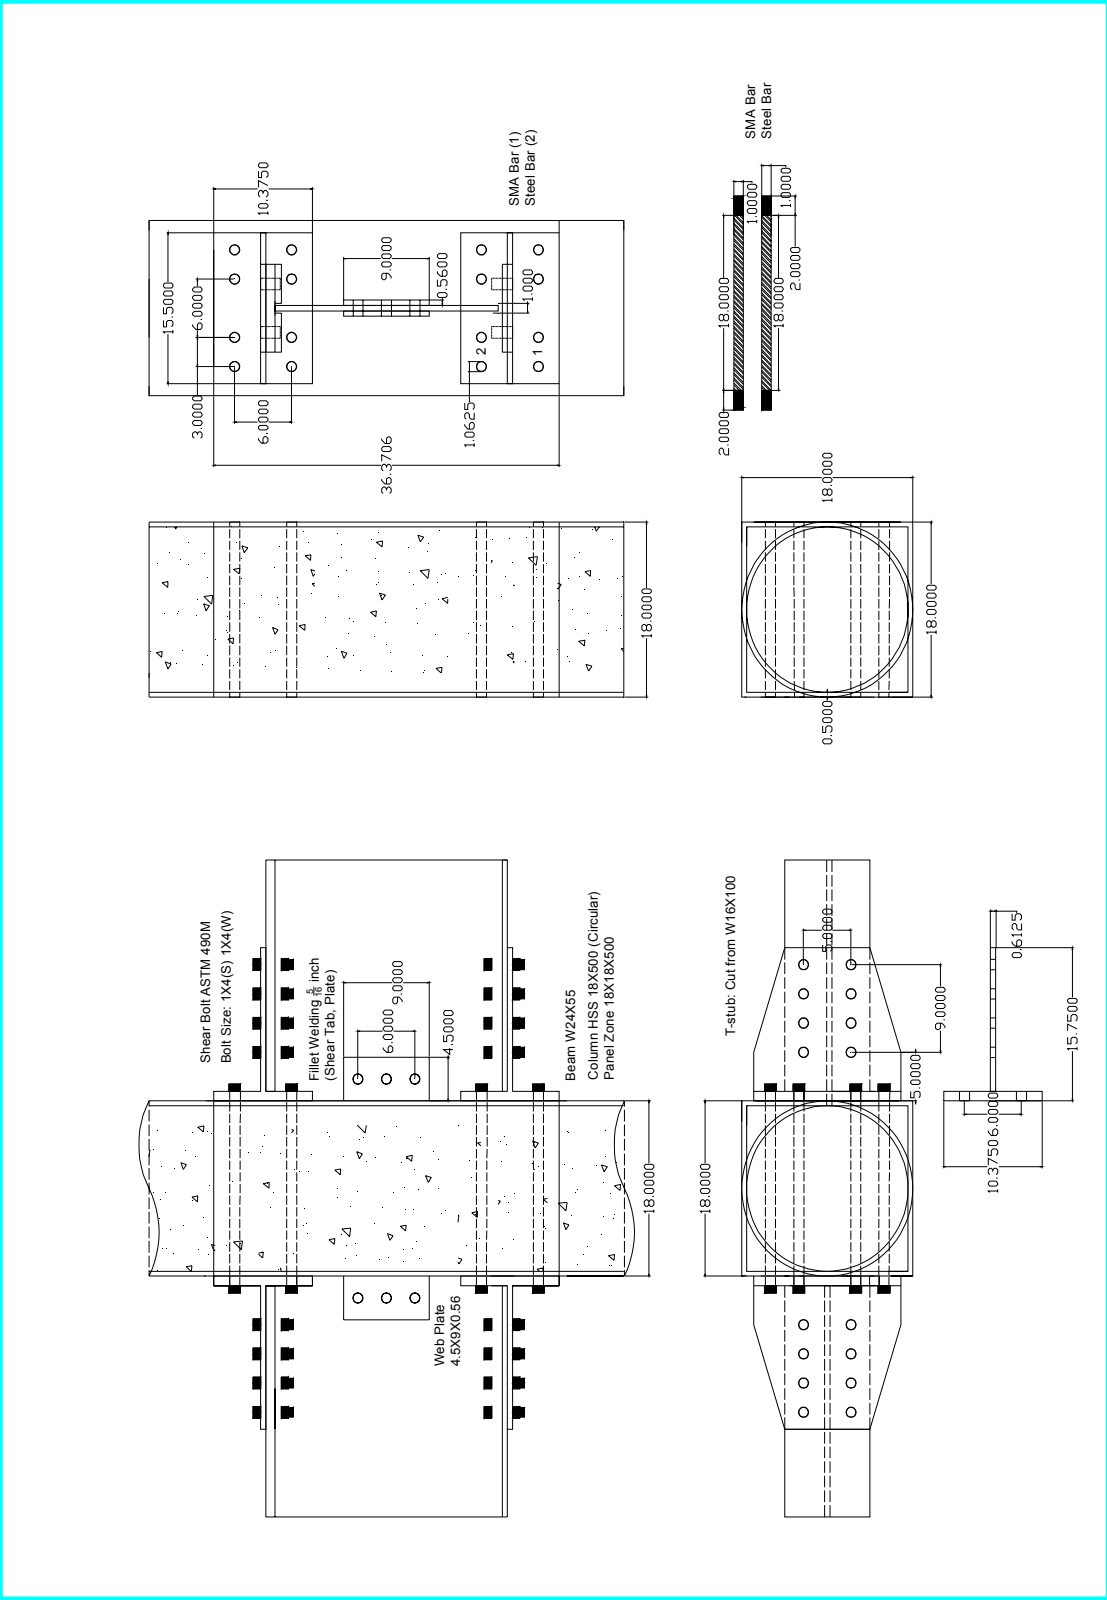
Schematic drawing of CCFT T-stub connection details
